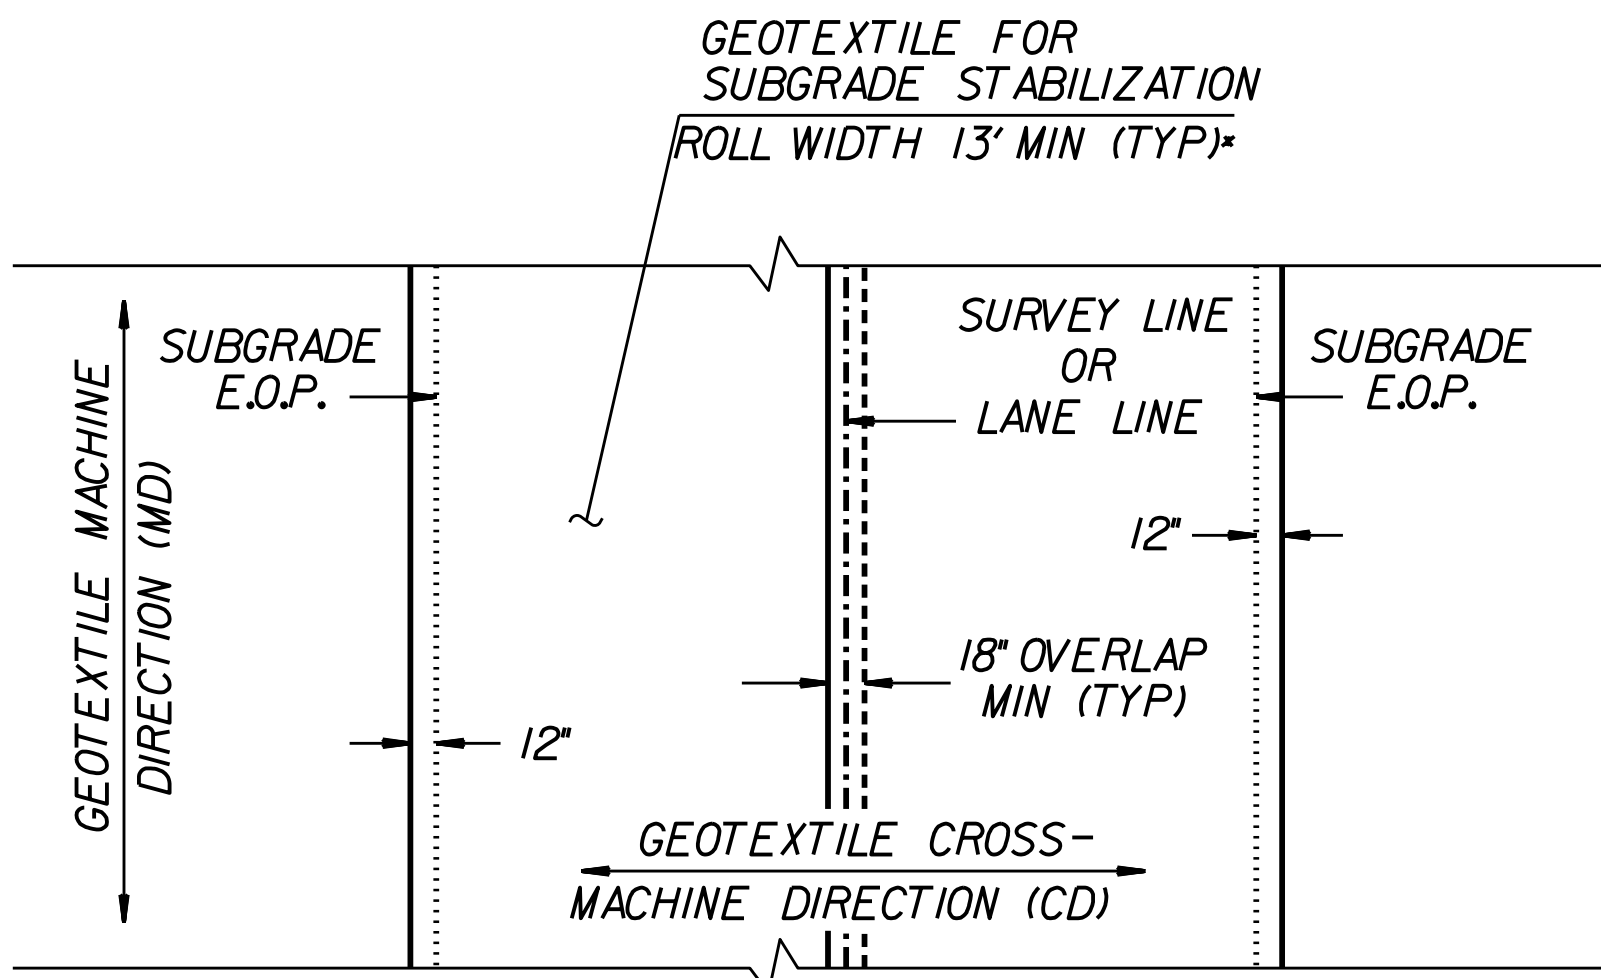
DETAIL SHOWING CHEMICAL STABILIZATION-GEOTEXTILE FOR SUBGRADE STABILIZATION FOR PAVEMENT WITH ABC
